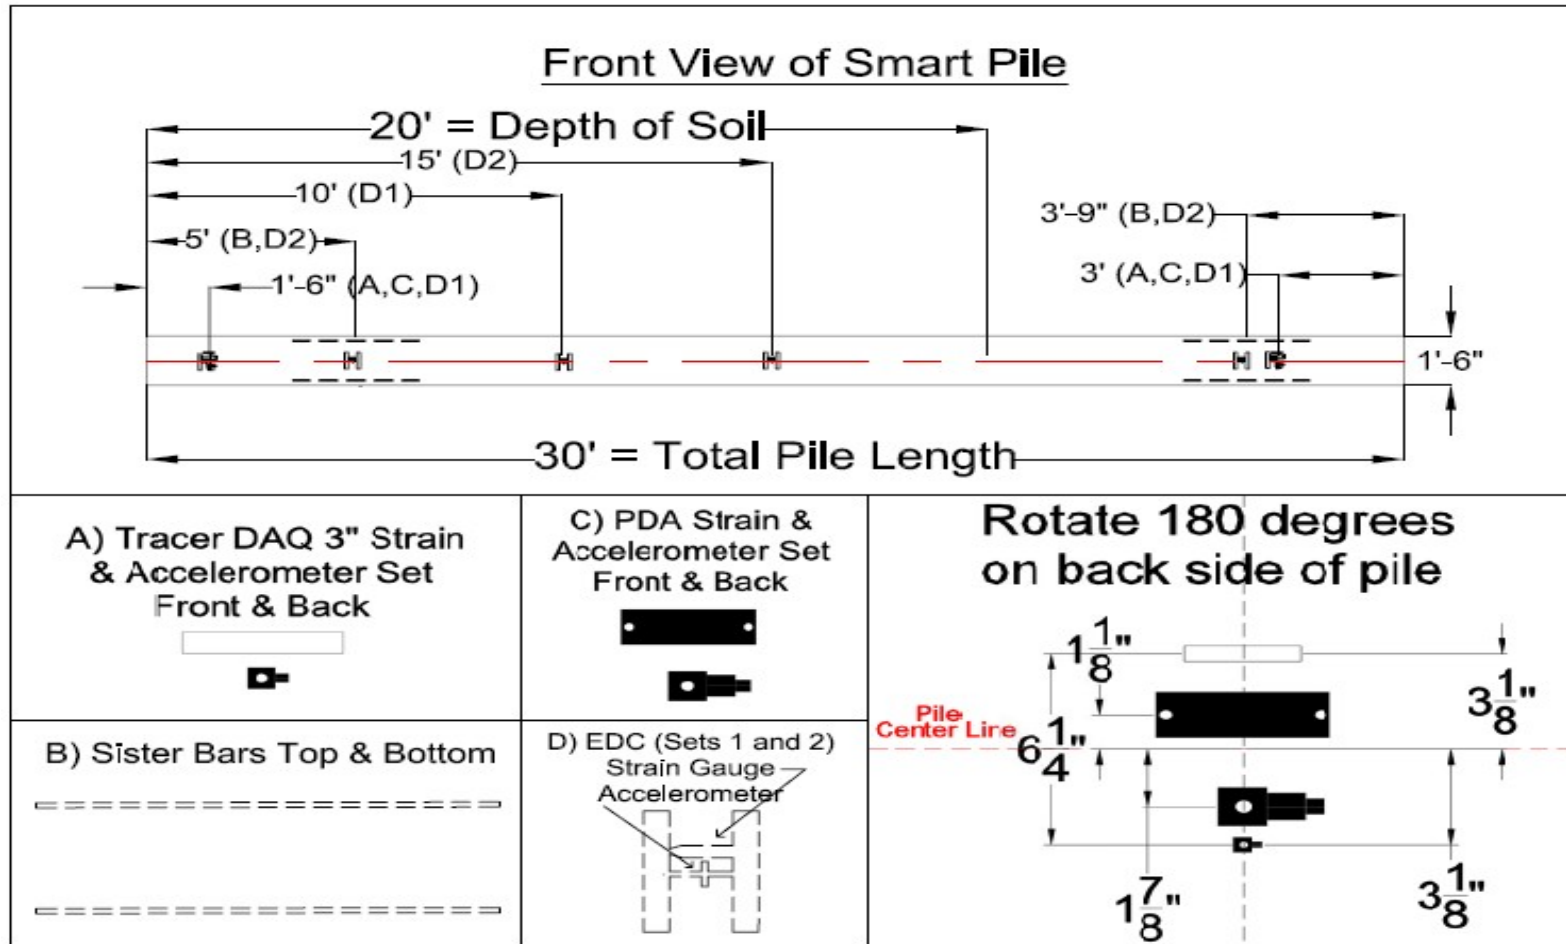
Layout of the internally and externally instrumented 18-in \times 18-in \times 30-ft test pile.
